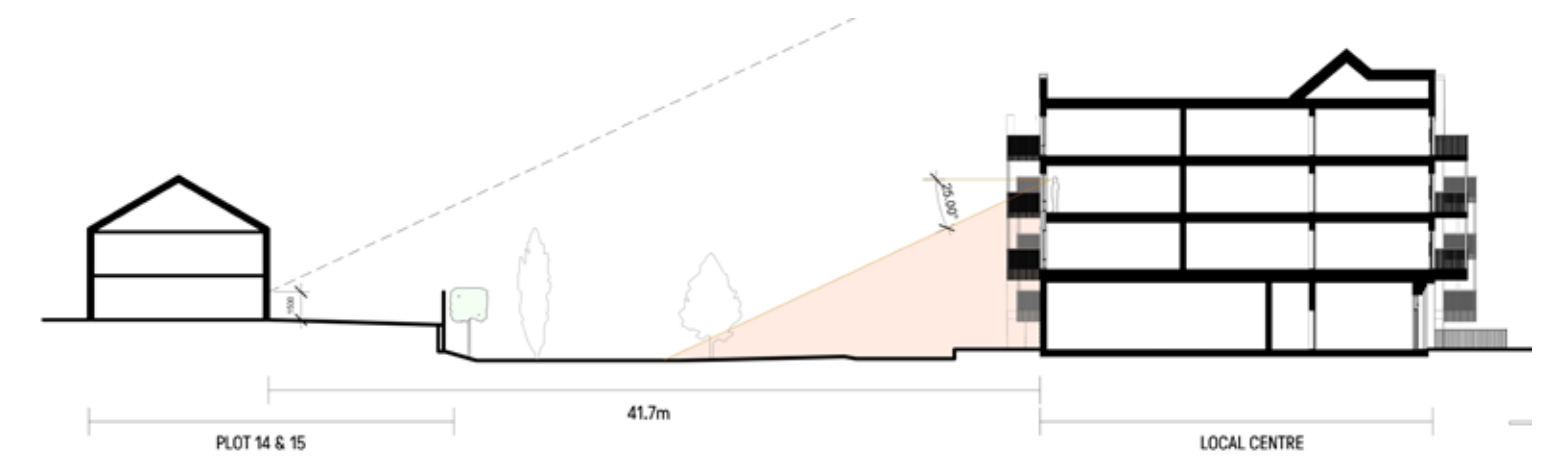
Local Centre & Plot 14 & 15 Second Floor Privacy Section post Design Workshop/Update
